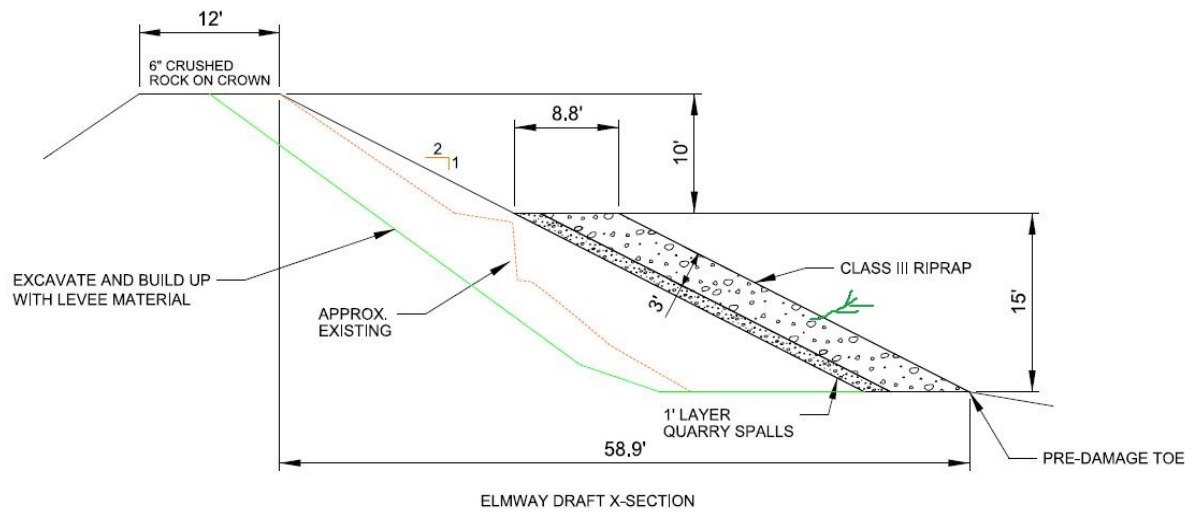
Typical cross-section of proposed levee repair, with willow lift at OHW.
